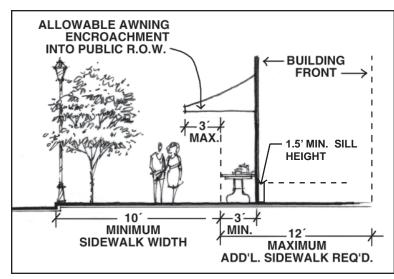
Pedestrian access easements on all streets in the UDO with the exception of Franklin Road which requires a minimum usable sidewalk width of eighteen (18) feet.
